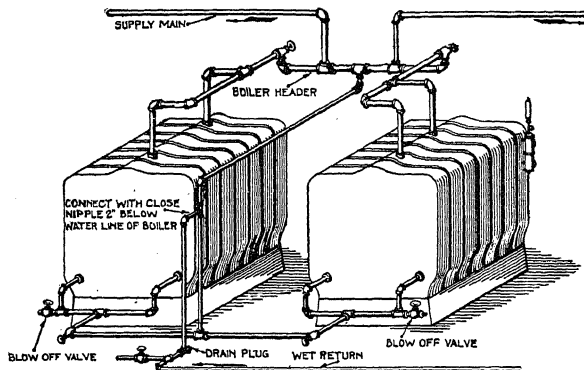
Method of connecting two boilers. Safety valves not shown.
